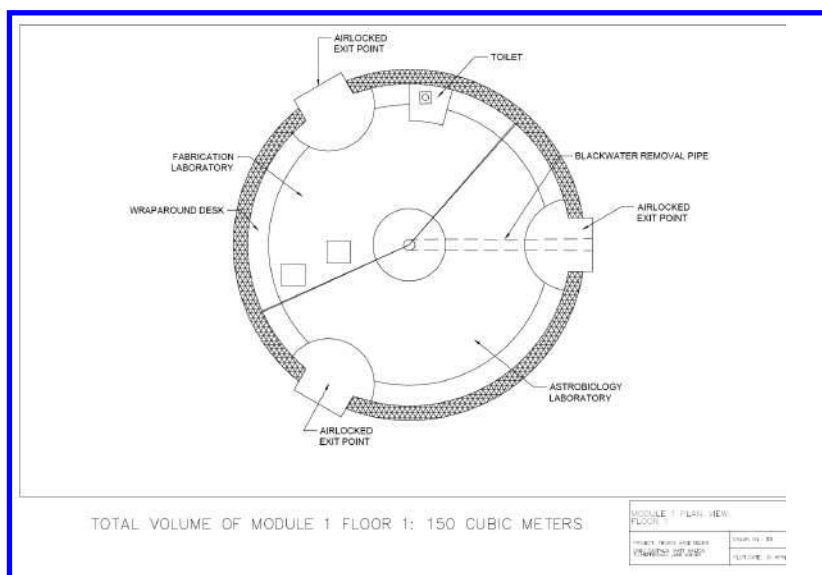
Plan of the UVM “Module 1” foundation module.
